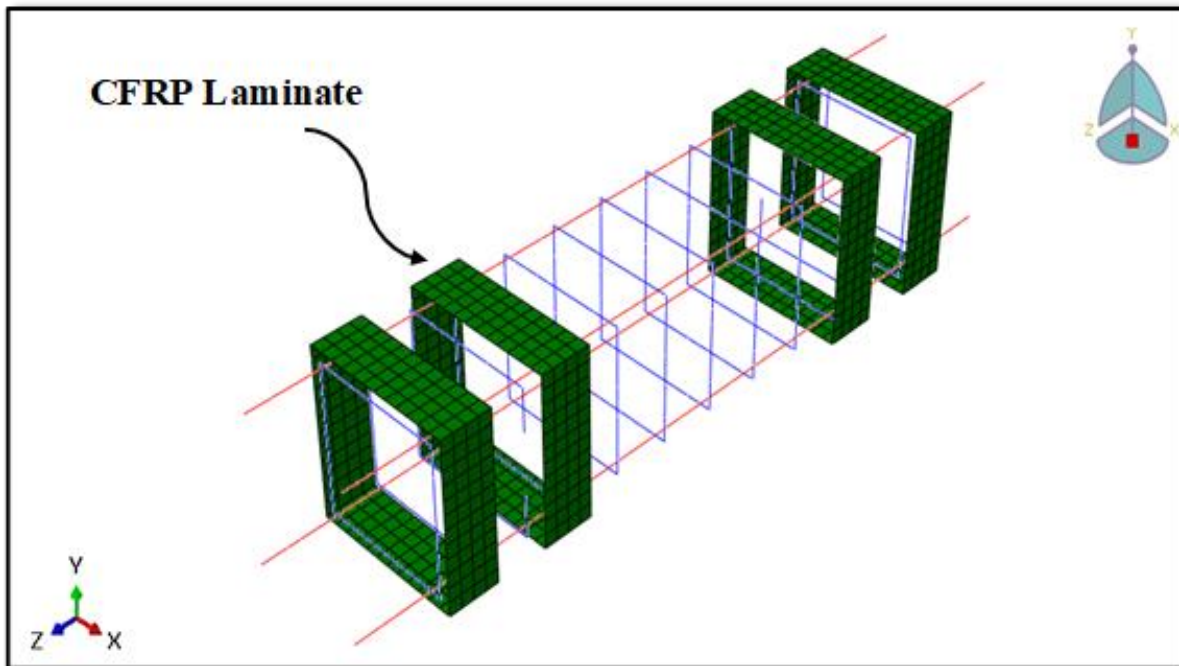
2: CFRP Laminates arrangement of the tested beams
